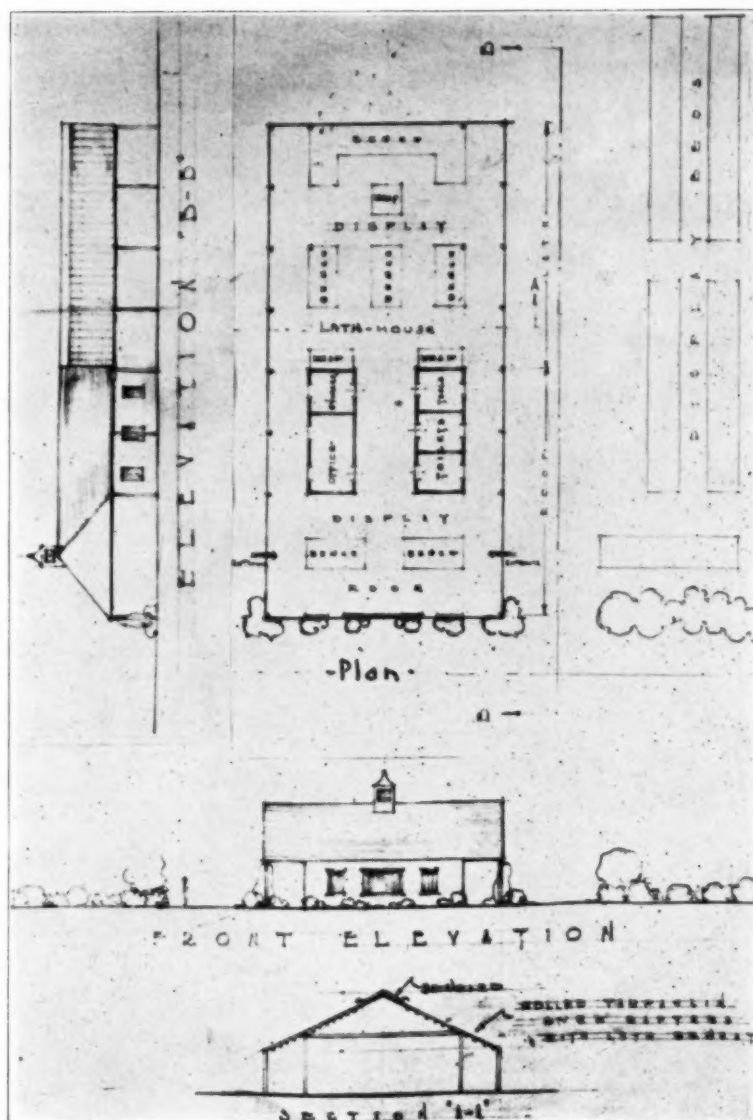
is from the plan of E. M. Buttery, Bethel, Conn. Here is a simple layout for a sales building with lath house attached.
